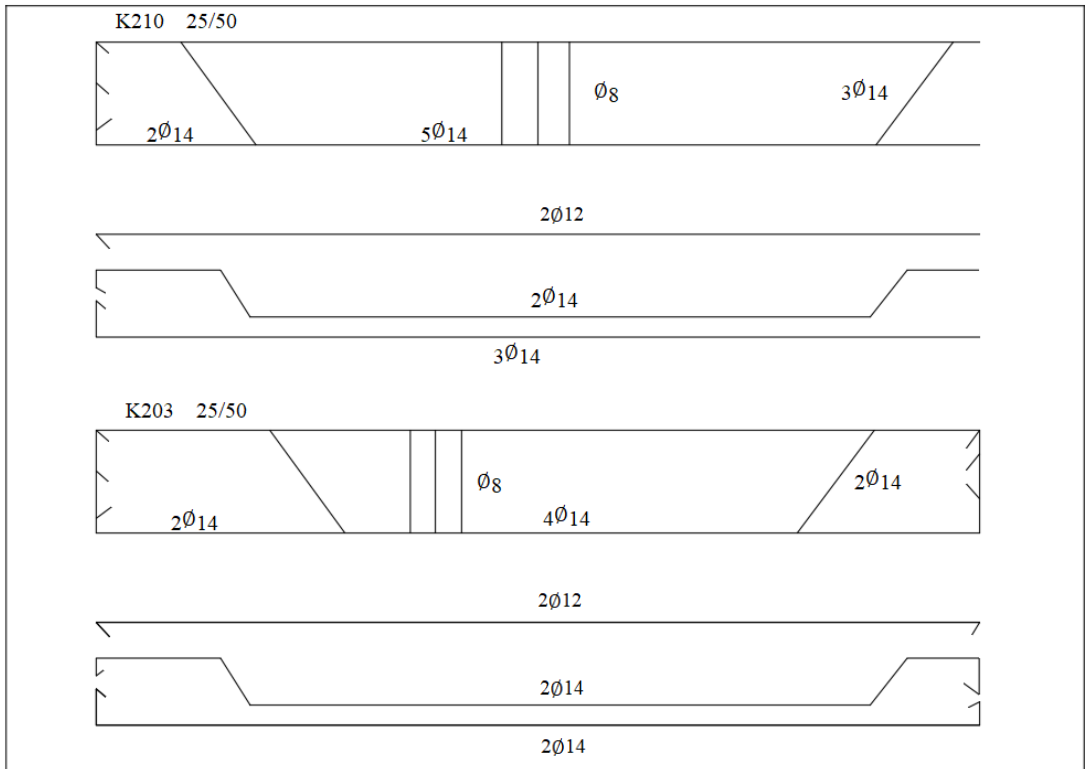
Reinforcement rebar of beams of studied building (K210 and K203)
